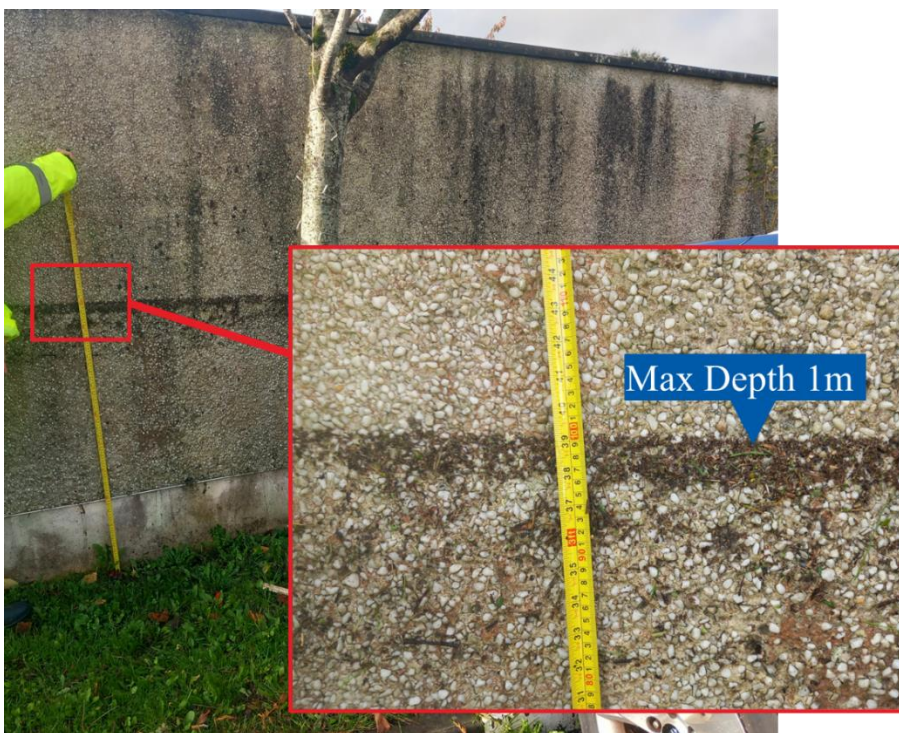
Wrack Mark on Wall at rear of First Steps Creche
